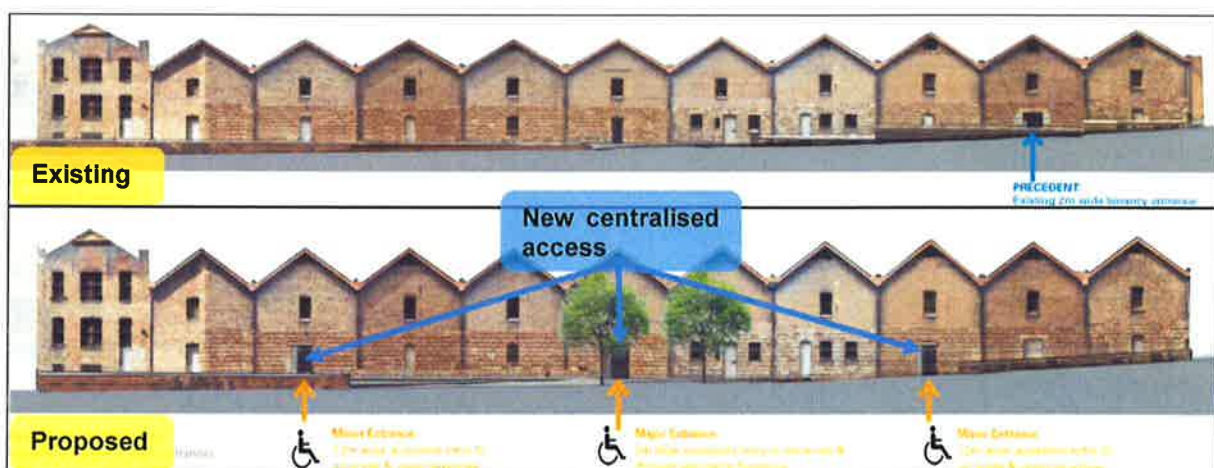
The proposed enlarged openings to Bays 3, 6 and 9 from Hickson Road (Source: Applicant's RtS).
